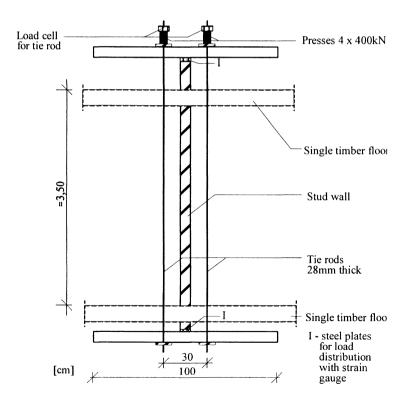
Model of load application to determine deformation out of the wall plane and failure loads
